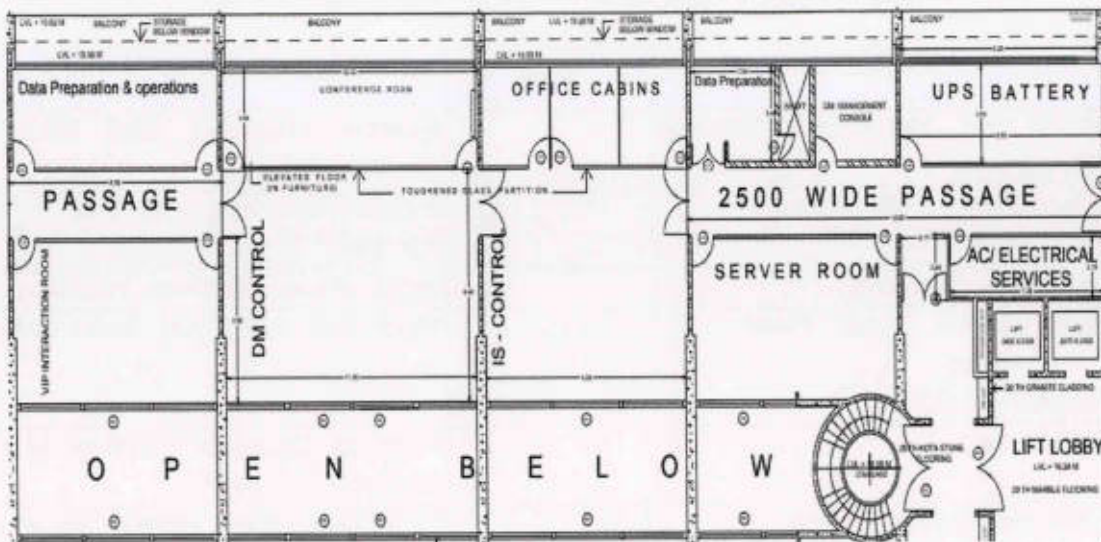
Floor layout / Plan with furniture for ICR ER at NDCC Tower
